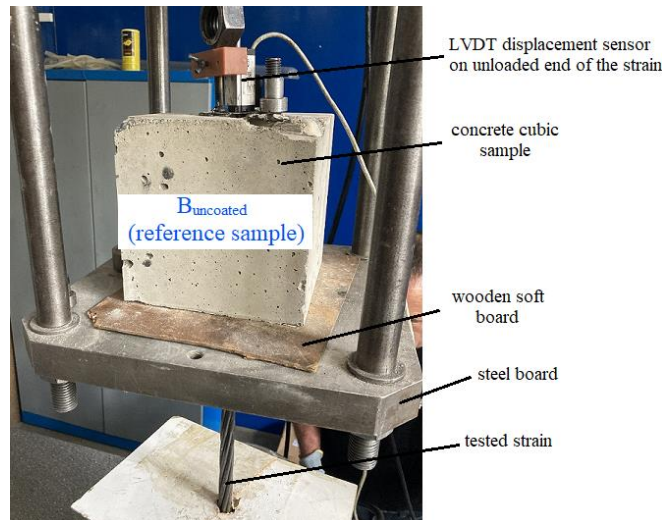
Experimental arrangement of bond strength pull-out test of prestressing strand reinforcement in normal strength concrete
